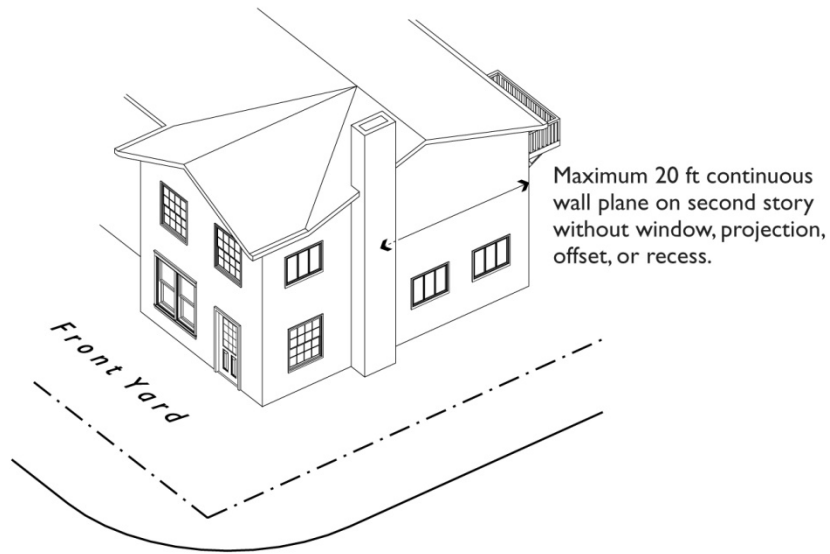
B(1): TWO-STORY DWELLINGS ON CORNER LOT
